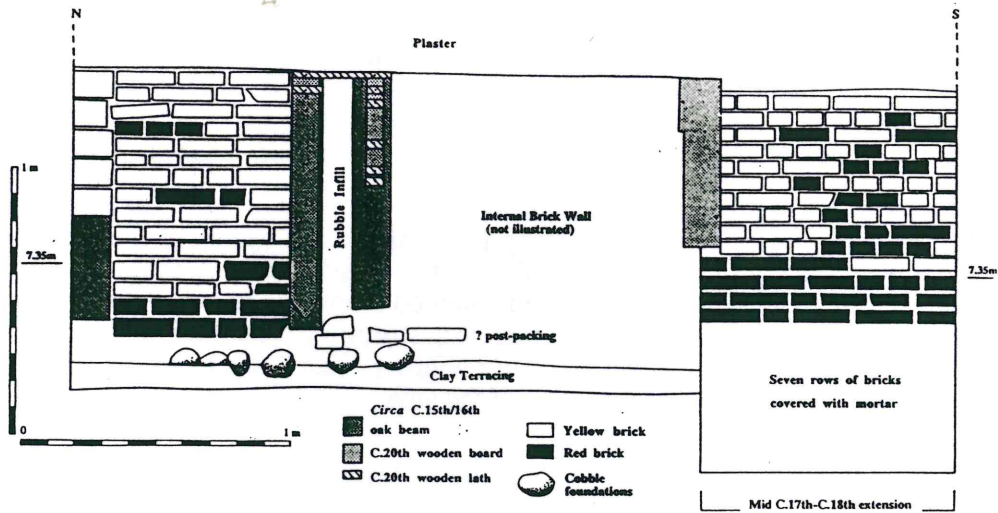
West Facing Section of External Wall of Hall Showing Mid 17th - Early 18th Century Brick Infilling and 13th Century Cobble Foundations Over Clay House-Platform (by S. Leith)
